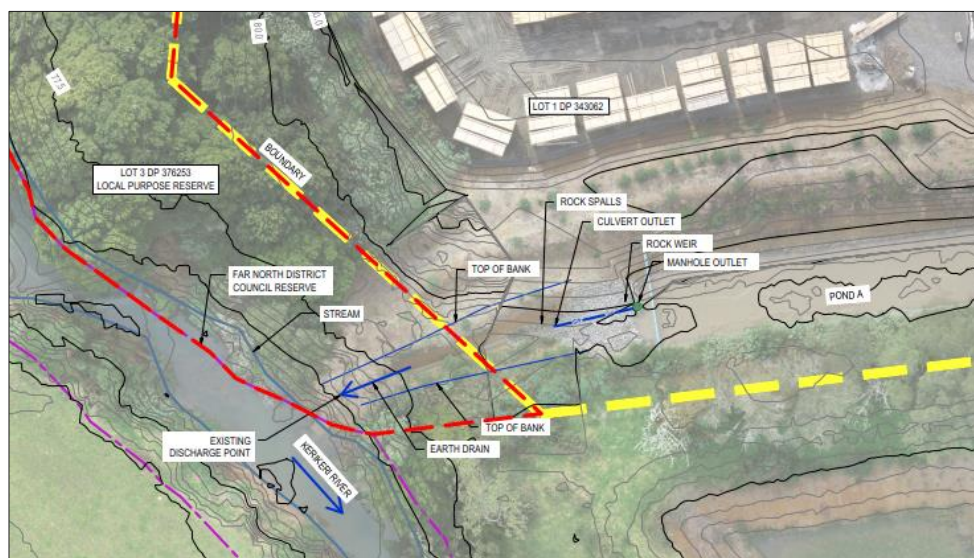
Plan showing the stormwater discharge (Source: Haigh Workman)
